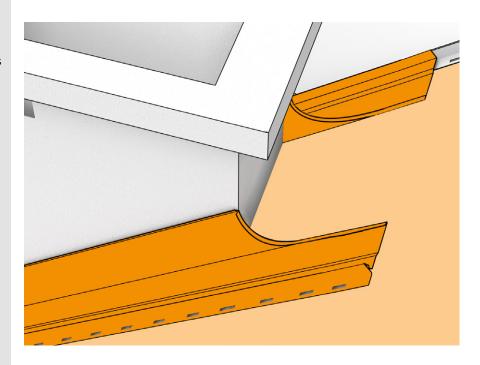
CONNECTING THE FLASHING TO THE REBATE
